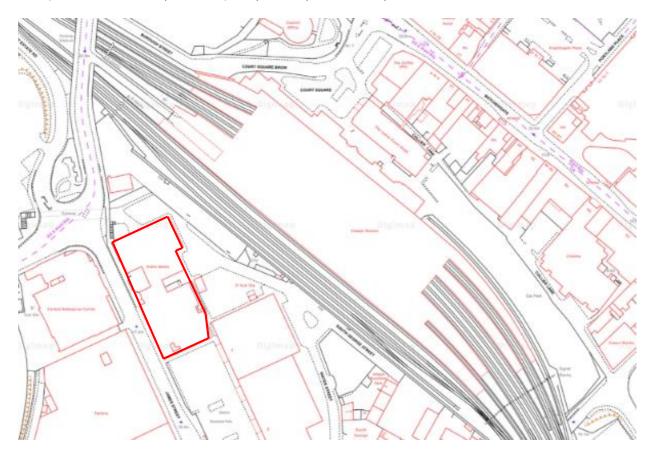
James Street Baths Site location plan Site Outlined in Bold Red
